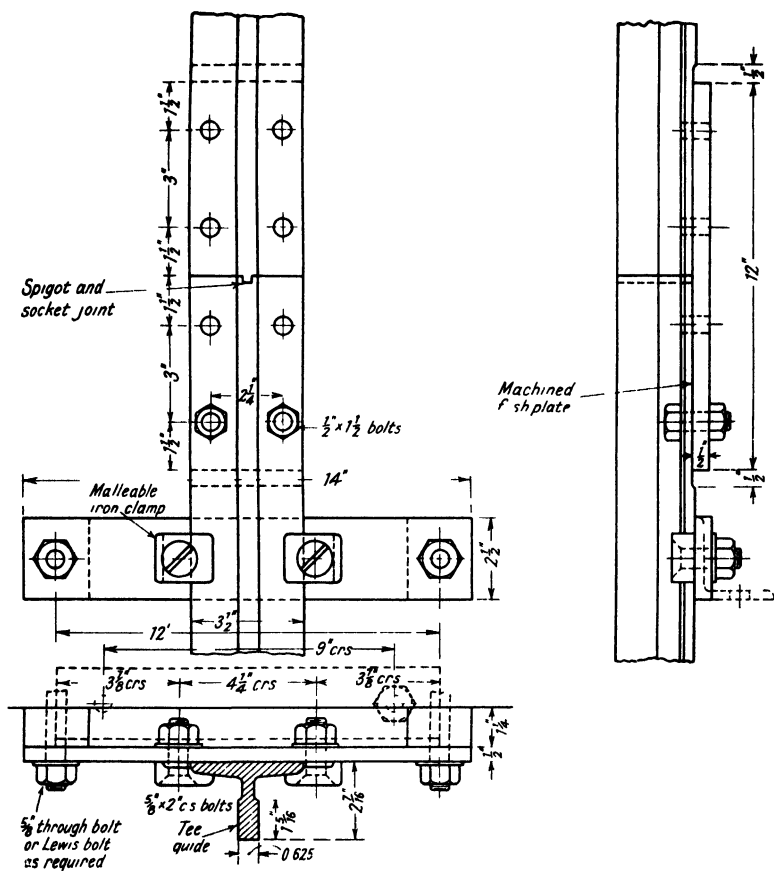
ARRANGEMENT OF CAR GUIDE FIXED TO WALL OR STEEL STRUCTURE
